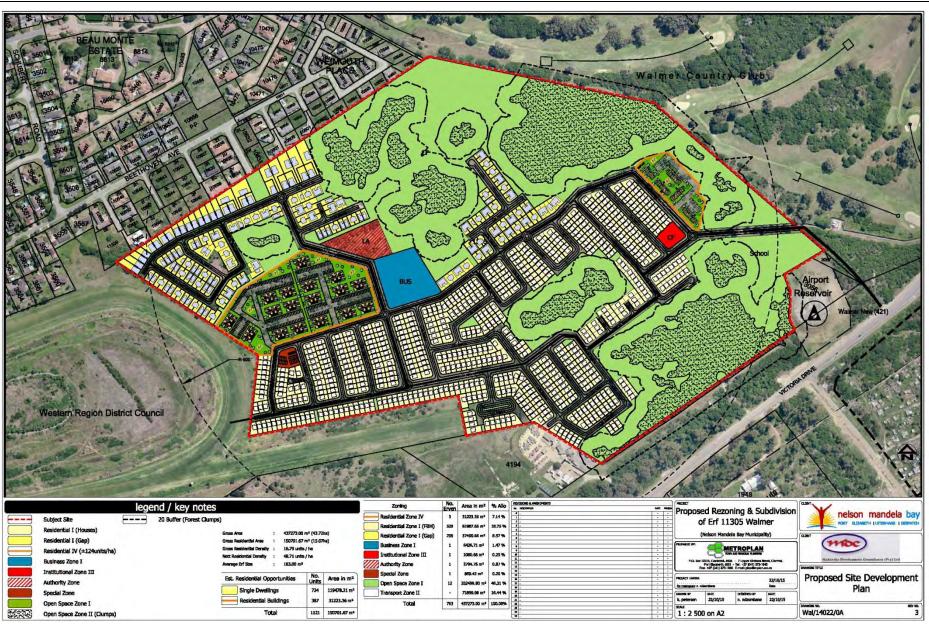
Preliminary proposed site development plan Layout Alternative 4
